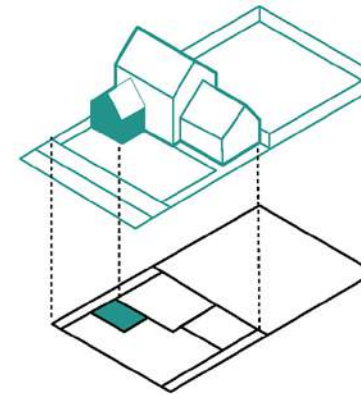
An acceptable example of a front extension which is smaller in scale than the existing building, mirrors the roof pitch, and covers less than 50% of the front elevation.
